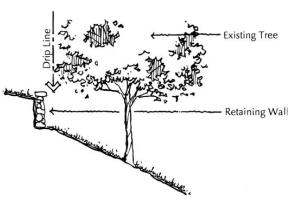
Tree Protection - retaining Wall (para. 6.3.5)
